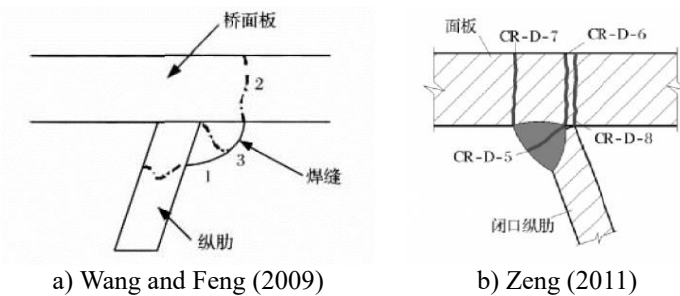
Different types of crack on rib-to-deck welded joints
